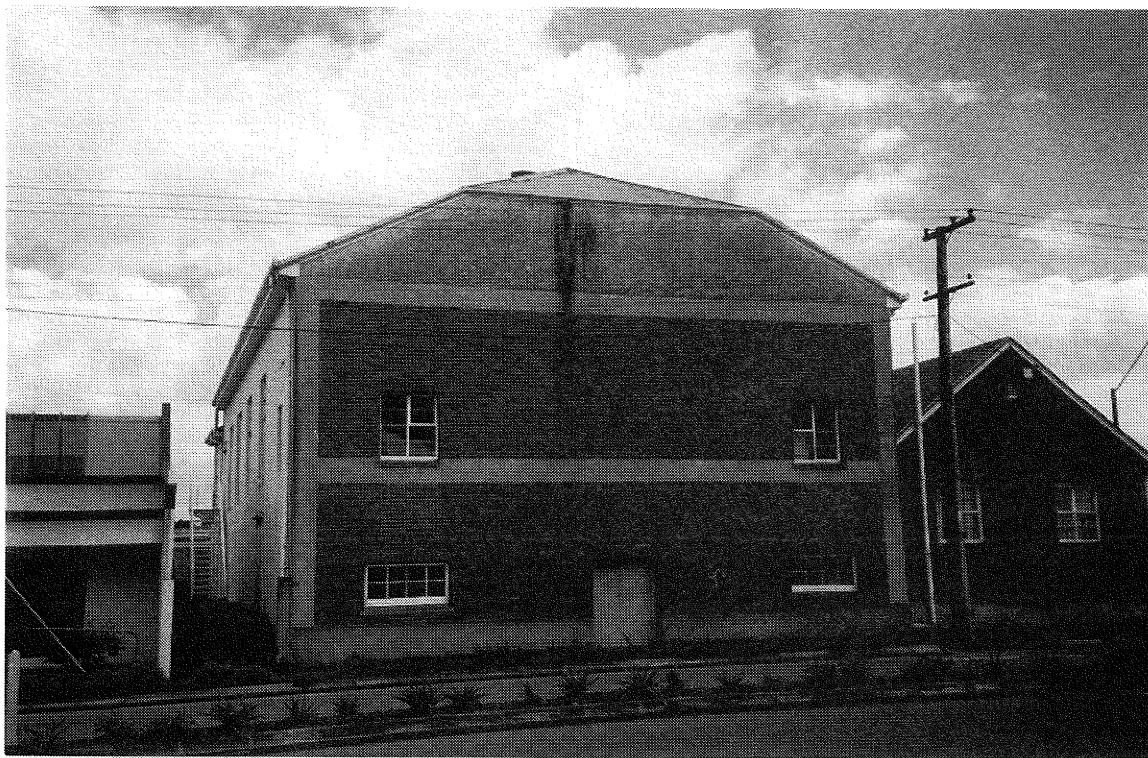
Present day views of 2-storey 1938 Knox Church Hall in Masterton, with a reinforced concrete frame and brick infill, which suffered little or no damage during the 1942 earthquakes. (Photograph by D.J. Dowrick, 1998).
